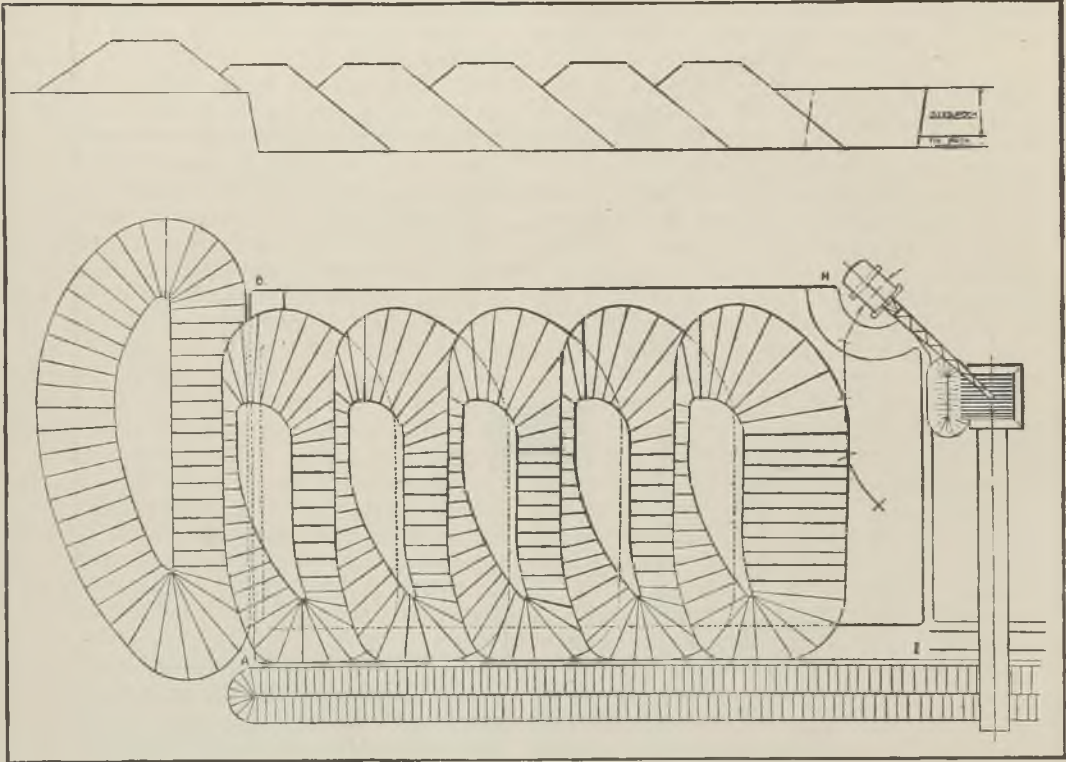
DRAGLINE COMPLETING SIXTH CUT.
